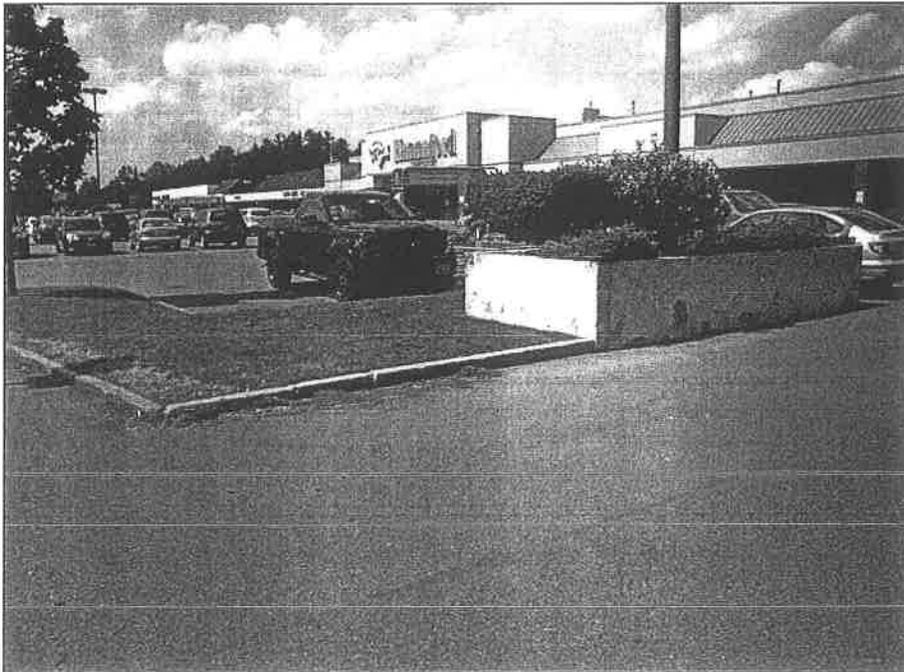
Existing landscaped island and planter to remain in the Hannaford To Go area
